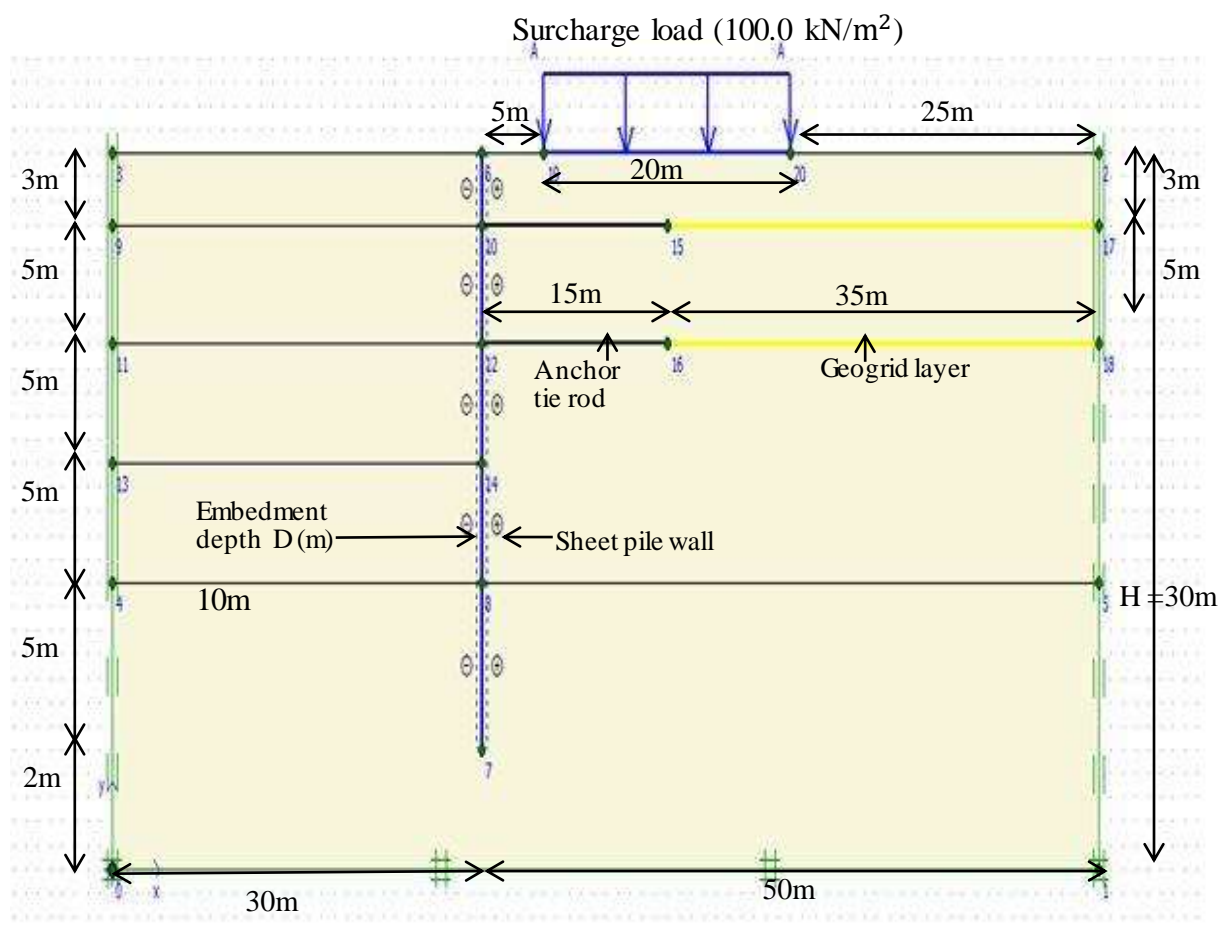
Modeling of the anchored sheet pile wall for analysis
